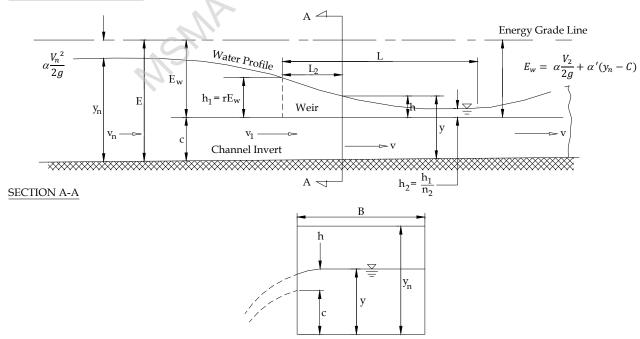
Typical Cross-sectional Hydraulics at a Side-Overflow Weir (Metcalf & Eddy, 1972)
